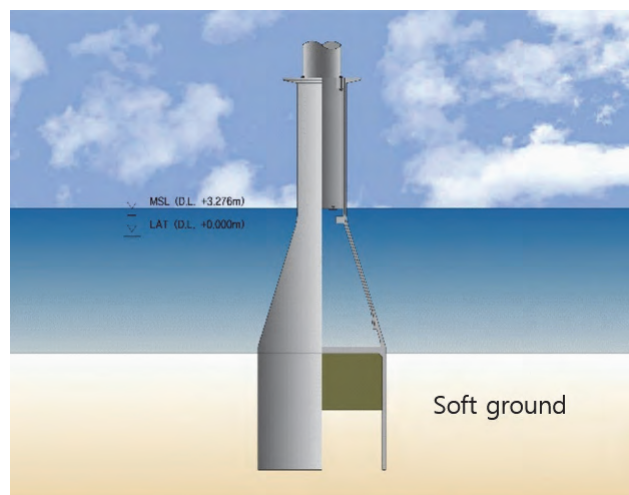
Concrete monopod suction foundation (KR and DAEWOO E&C et al. 2017).
